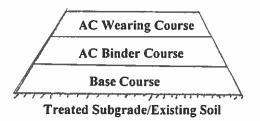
Typical Section for a Flexible Pavement (1/)
